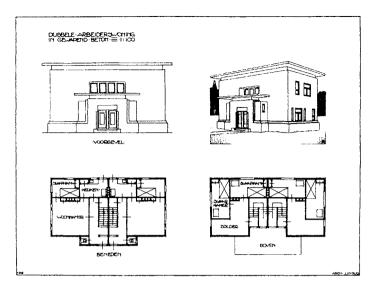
Design for double workers' house in reinforced concrete, J.J.P. Oud, Architect, 1918. Perspective, plans and elevation. © JJP Oud, 1918. Reproduced by permission of Viscopy Ltd., Sydney 1999.
